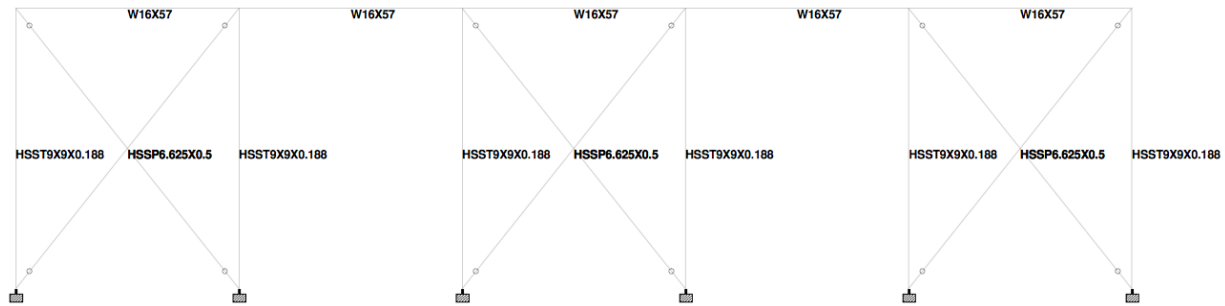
Steel Shear Wall Frame with Member Sizes
